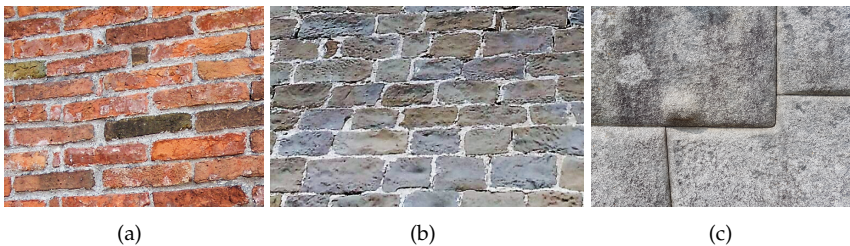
Examples of masonry: (a) brick masonry, (b) stone masonry and (c) Inca’s masonry (dry stone masonry).
